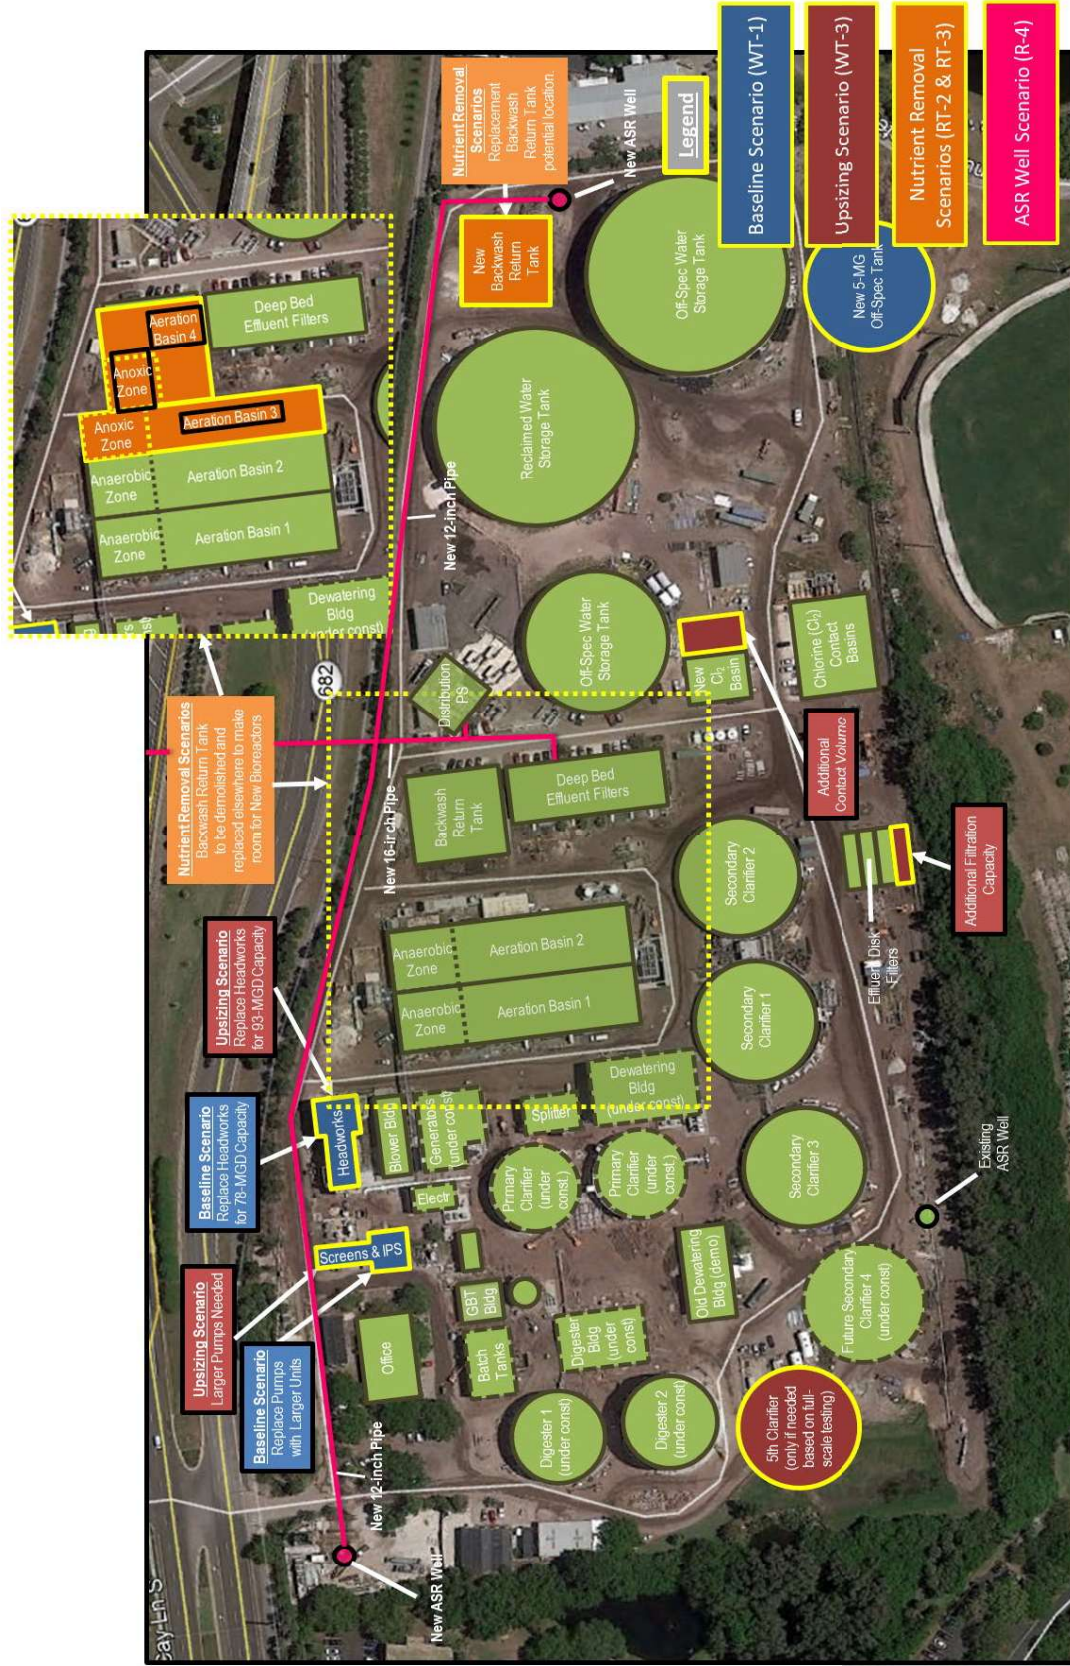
Site Layout Plan for the Southwest WRF
